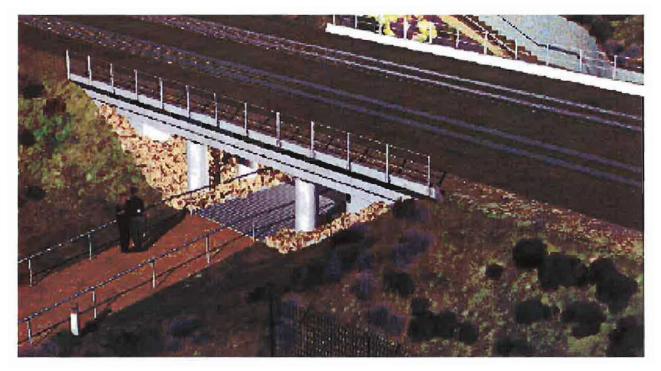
Artist's rendering of a conceptual UPRR Standard Precast Concrete Box Girder Underpass (Source: City of Encinitas)
